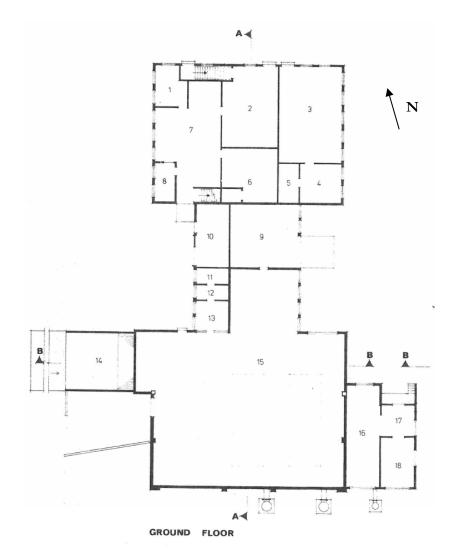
Boiler House, Plantroom and Maintenance Building – Ground Floor Plan
